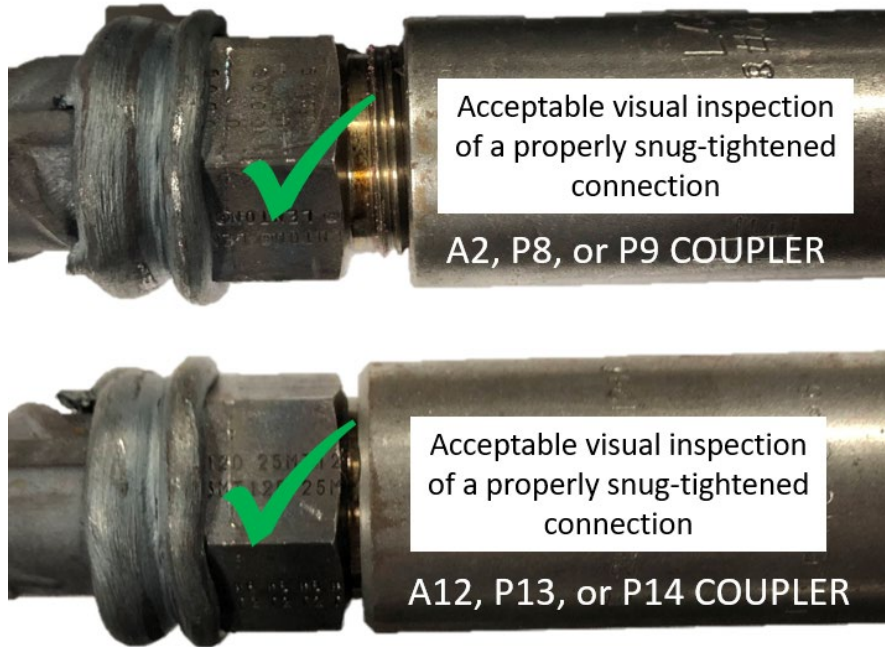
, TOP: Acceptable visual inspection of LUxxMT12 installed to the A2, P8, or P9 female taper thread. BOTTOM: Acceptable visual inspection of the A12, P13, or P14 female taper thread.
